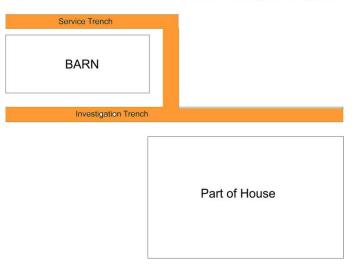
Plan view of service trench adjacent to barn (not to scale).
